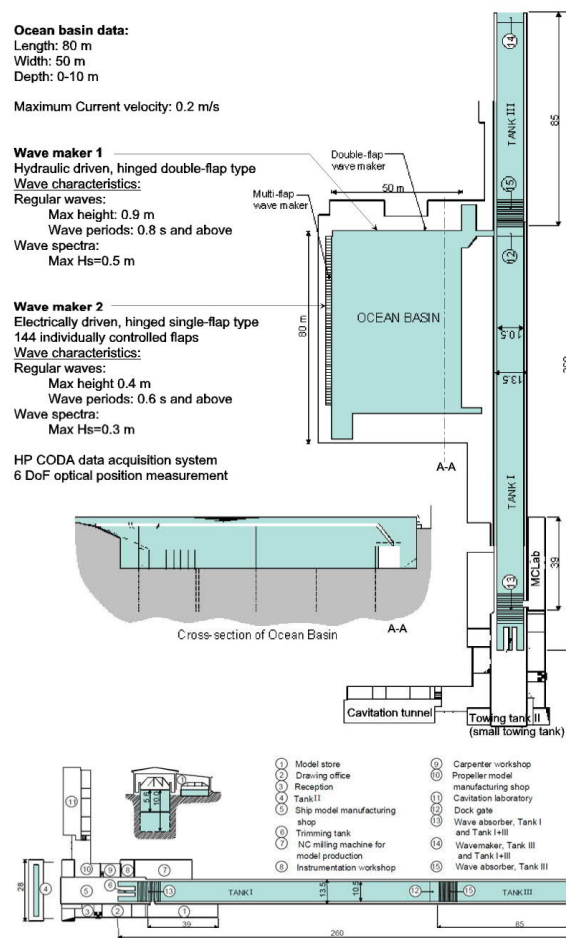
Typical layout of the facilities used in ocean basins, towing tanks and cavitation tunnels (Steen 2014)
